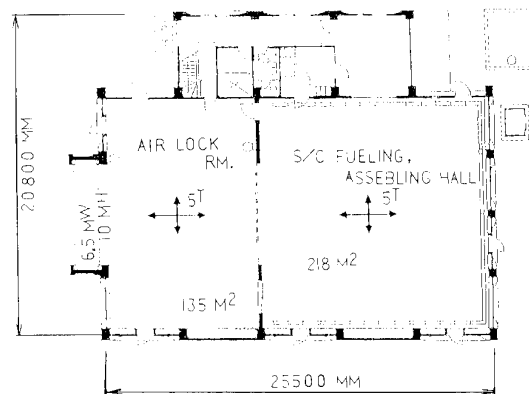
TSA (3rd Stage and Spacecraft Assembling Building)
